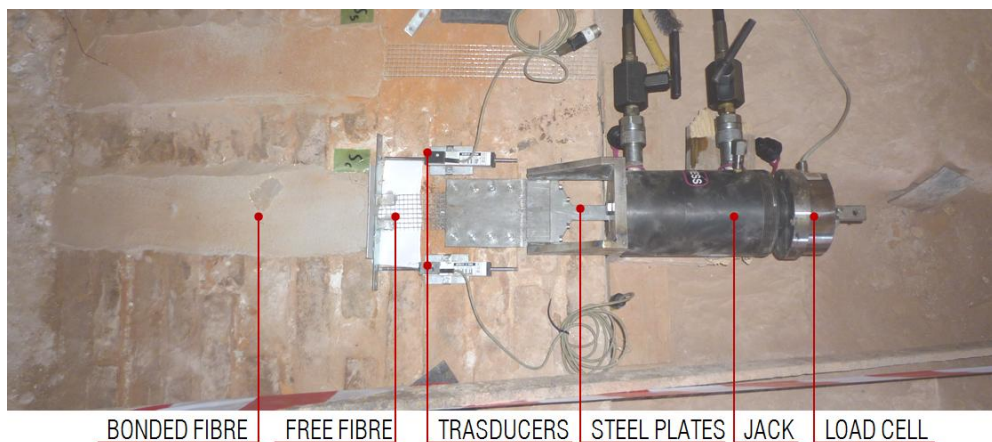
Set-up adopted onsite to test the in plane behaviour
